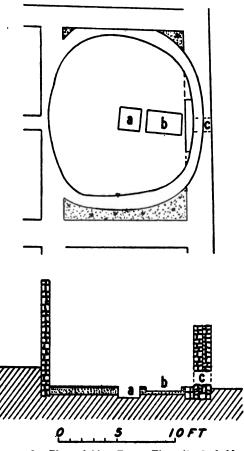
Plan of kiva B. a, Fire pit; b, ladder pit; c, ventilator
